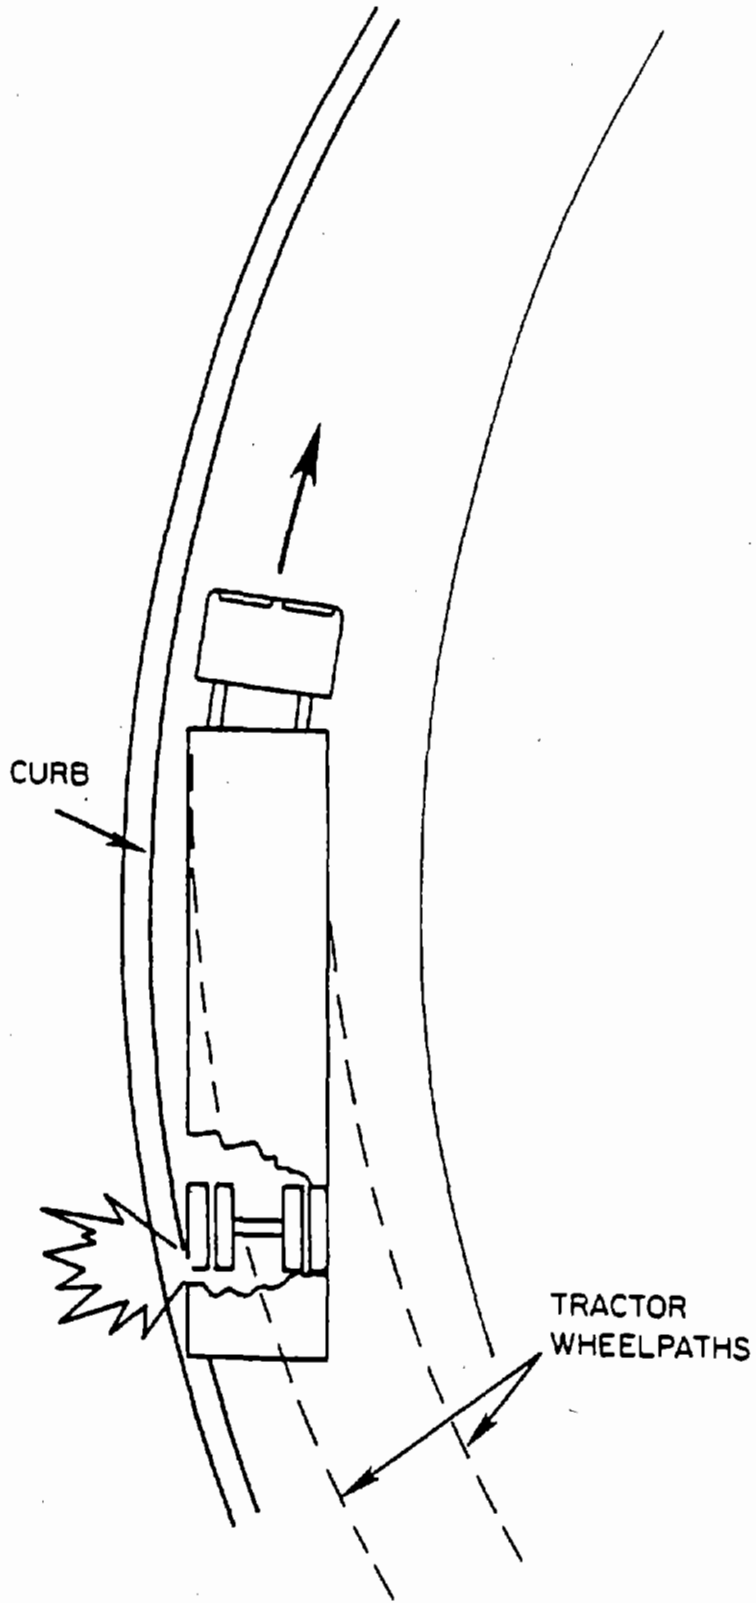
Site layout showing curb on outside of ramp exit.<sup>(1)</sup>
